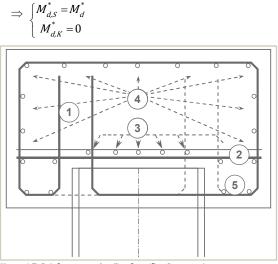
Reinforcement detailing for a 'fixed' connection.
